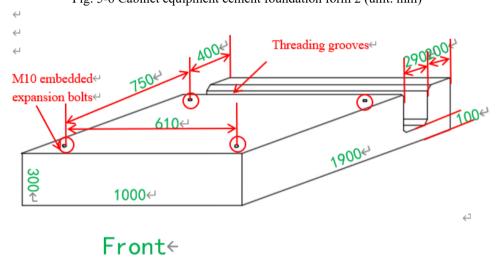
Cabinet equipment cement foundation form 2 (unit: mm)
